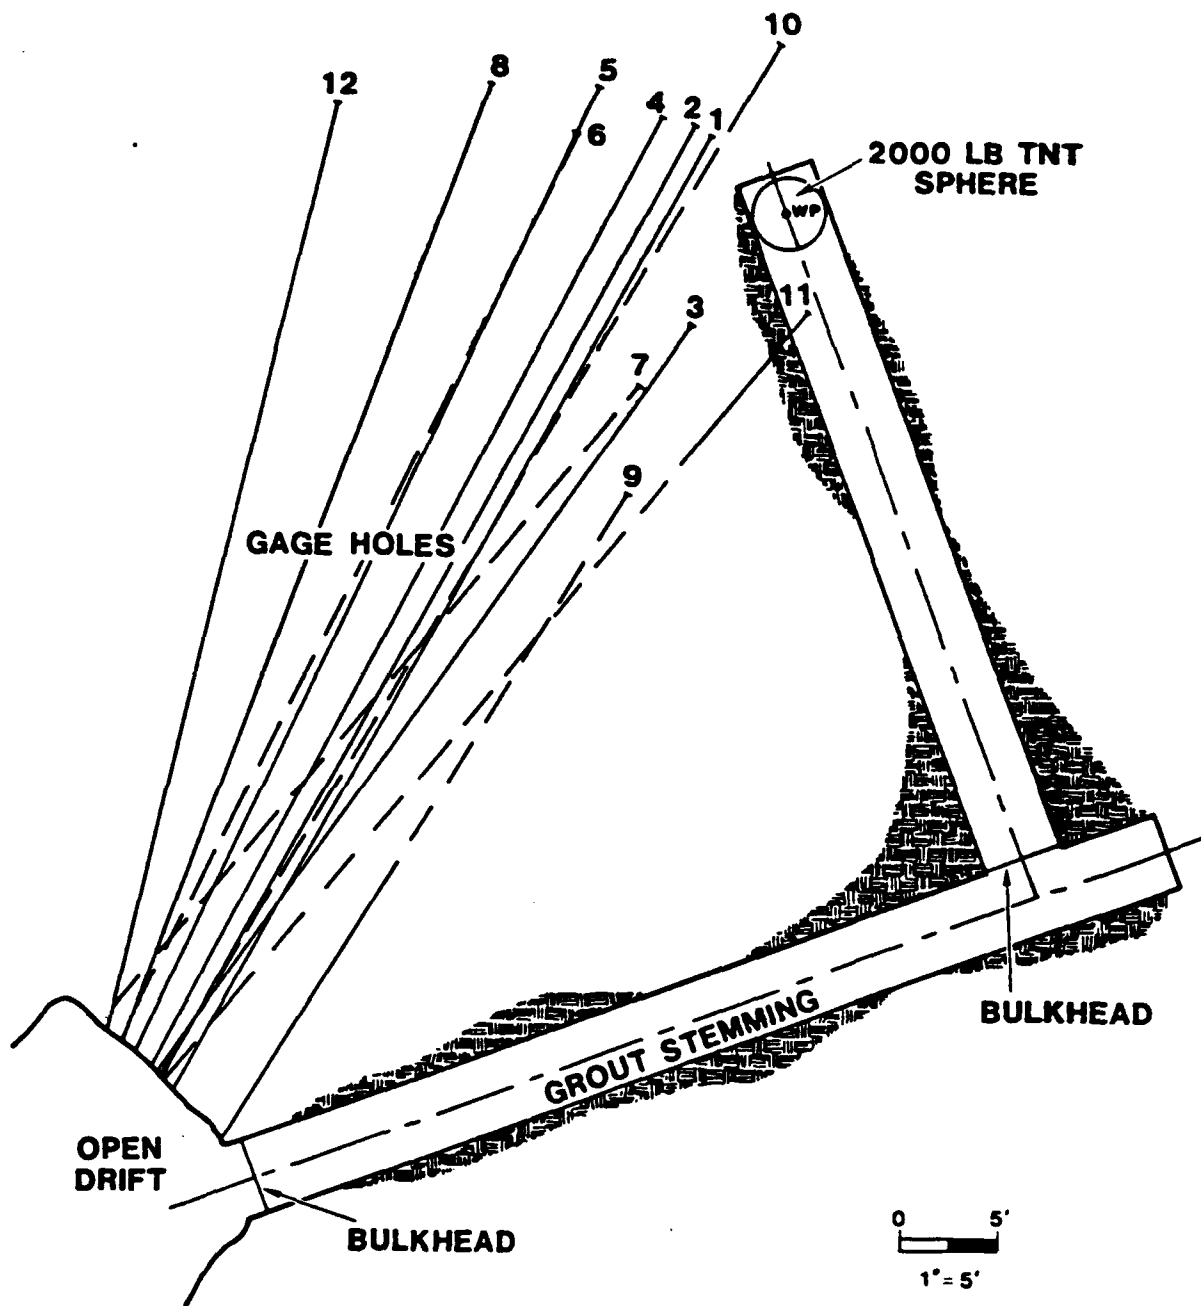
ONETON test layout - plan view (from Smith, 1983).
